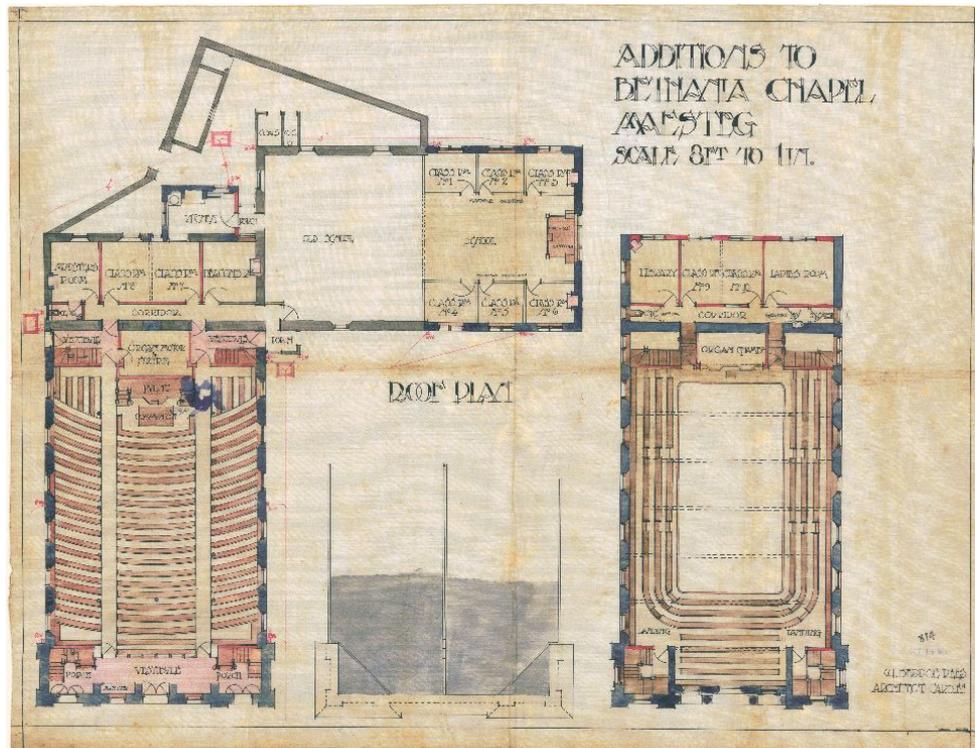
Architectural drawing by W. Beddoe Rees, 1906, showing layout of Bethania Chapel, Maesteg. (Welsh Religious Buildings Trust via the RCAHMW)
